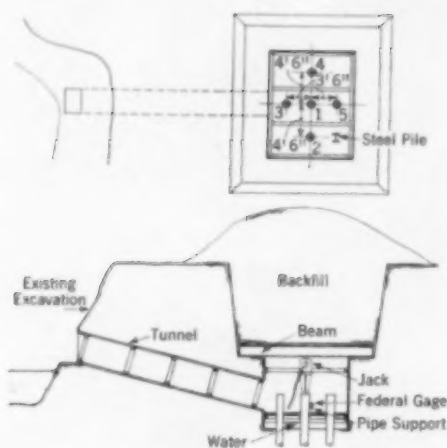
ARRANGEMENT OF PILES FOR GROUP LOAD TESTS
